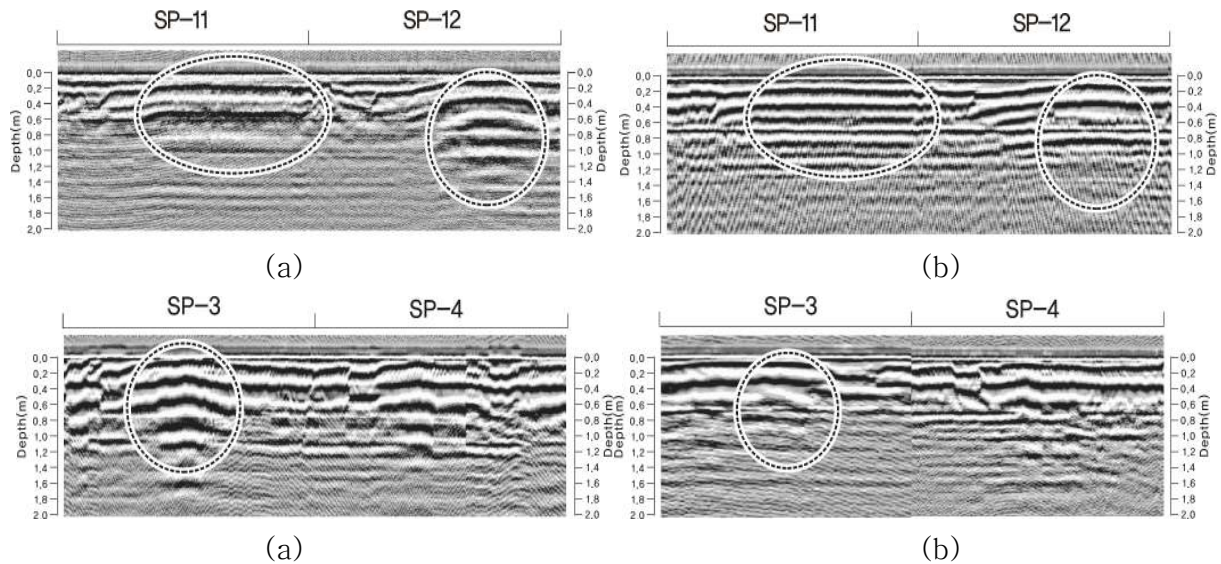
Comparison of (a) before, and (b) after backfill grout at span 11, 12 of tunnel A, (c) before and (d) after backfill grout at span 3, 4 of tunnel B.
